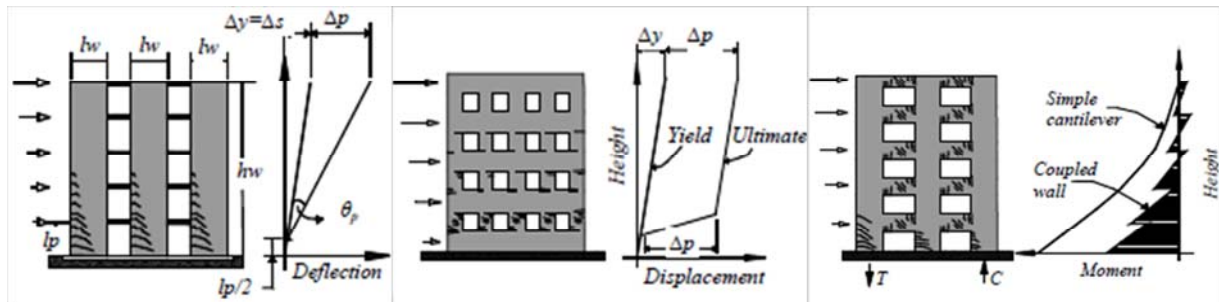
In-plane structural wall configurations: cantilever walls connected by flexible floors (left); coupled walls with pier hinging (middle); coupled walls with spandrel hinging (right) ([82], adapted from [81])
